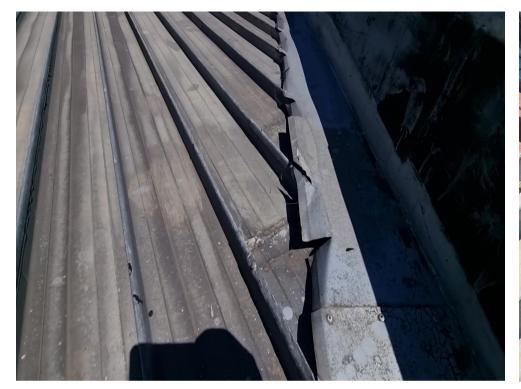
Image shows noticeable damaged flashing and extended sheets with rivets. New Flashing Figure 26: Image shows poor application of incorrect product. New flashing recommended. recommended.
